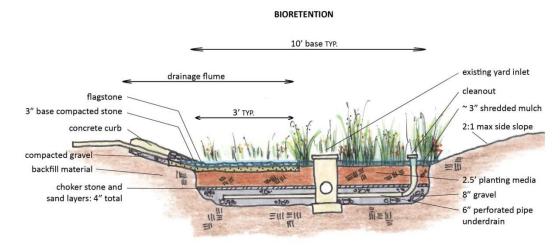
Conceptual Cross-section of Bioinfiltration Facility
